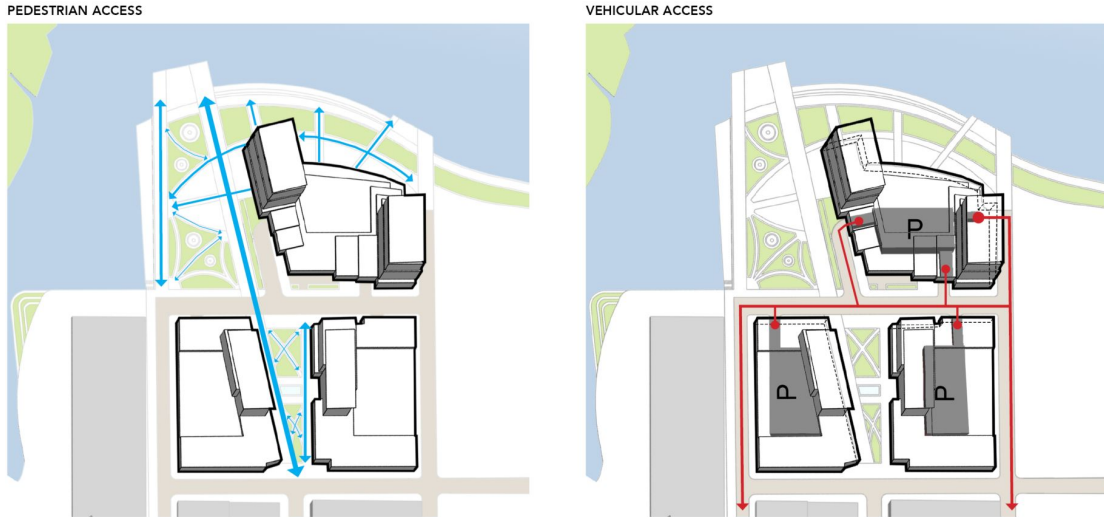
Site pedestrian and vehicular accessibility. (Source: Author)
